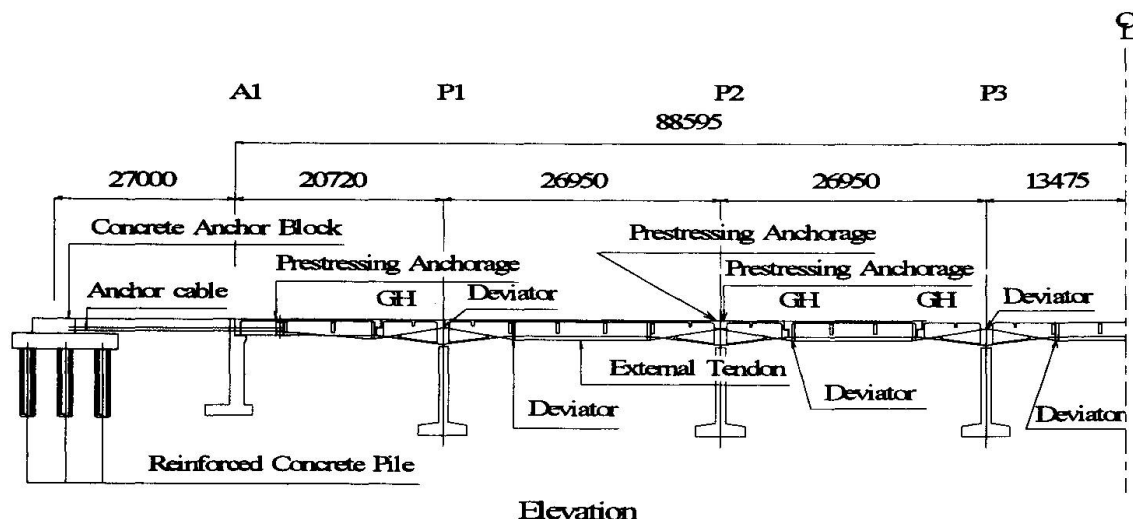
Cable Layout for Continuous Concrete Gerber Girder Bridge
